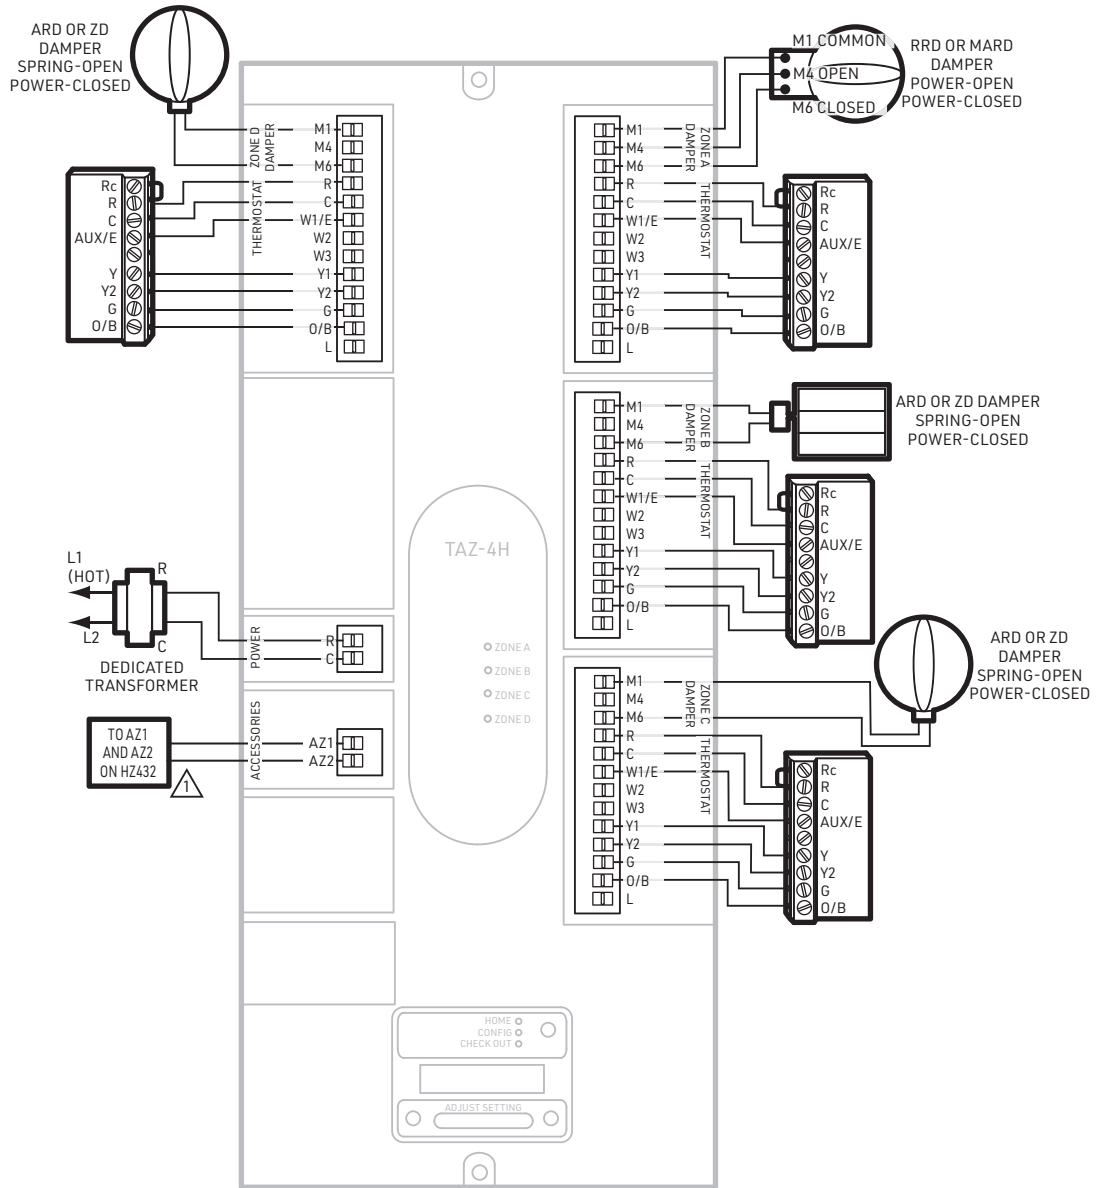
Zone panel wiring dual fuel: single-stage furnace and single-stage heat pump.
